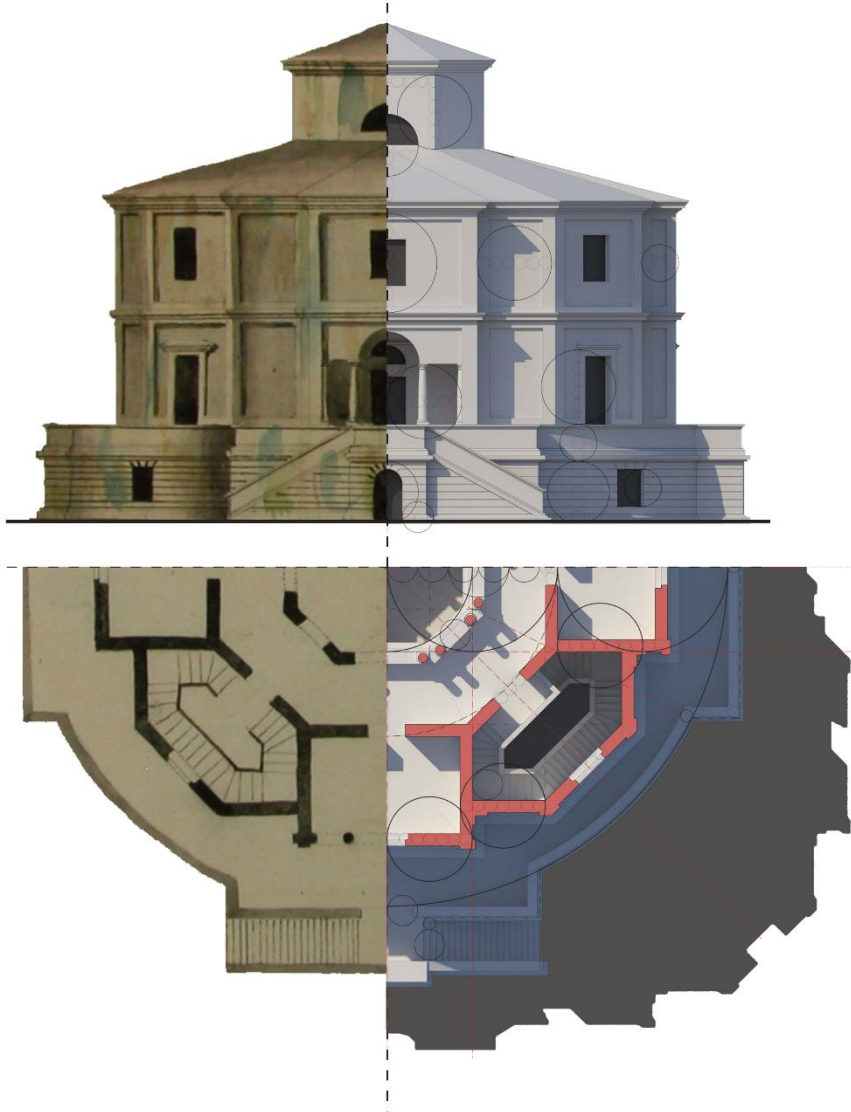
Elevation and plan. Reconstruction of Mauro Guidi's project "Palazzo isolato per un nobile" Atlante 46, Carta 193 [4].
